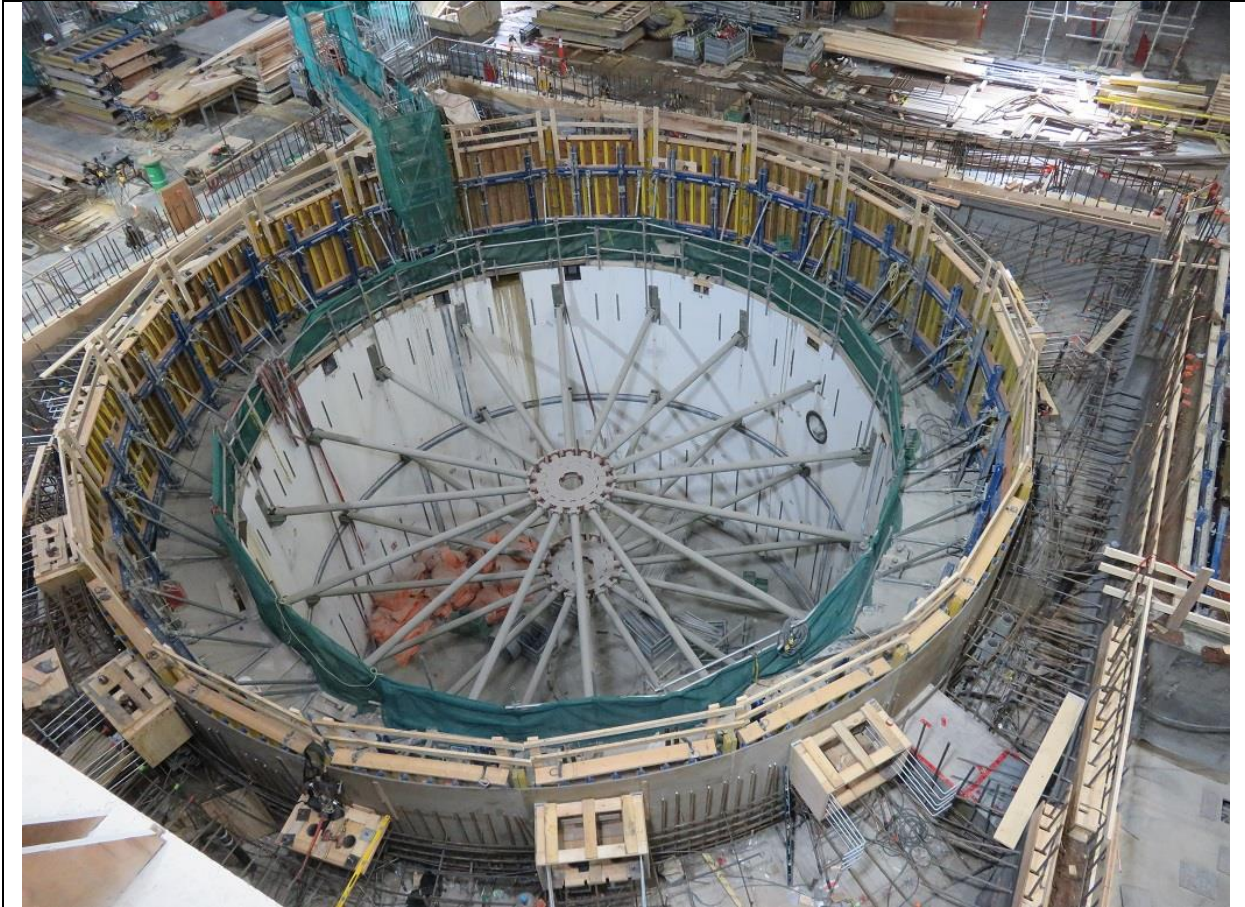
Second stage concrete around pit liner nearing completion in Unit 1.
